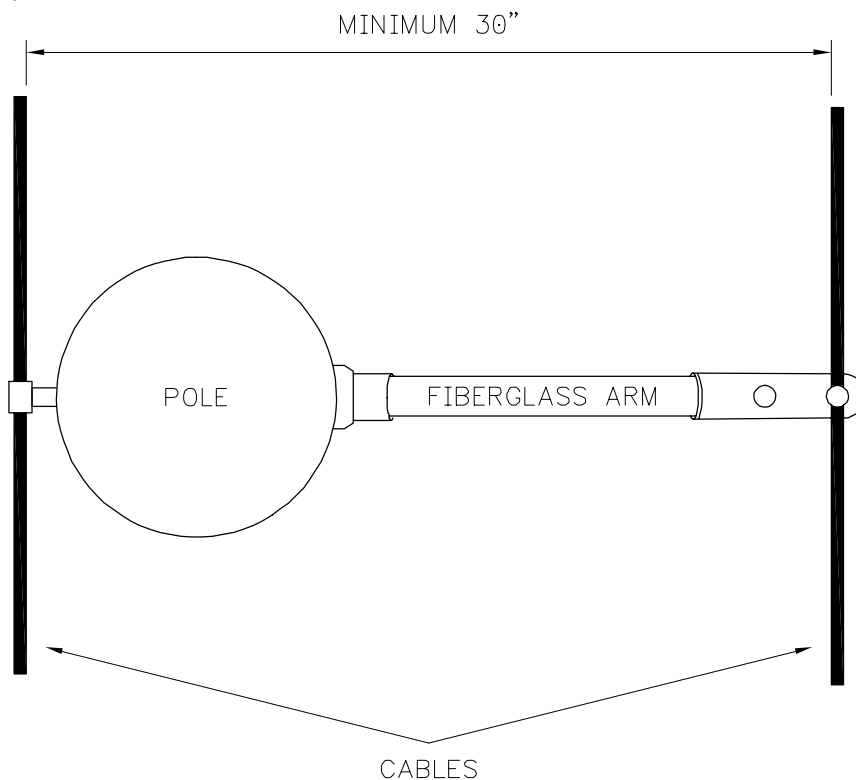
Horizontal Spacing Using Fiberglass Arm
